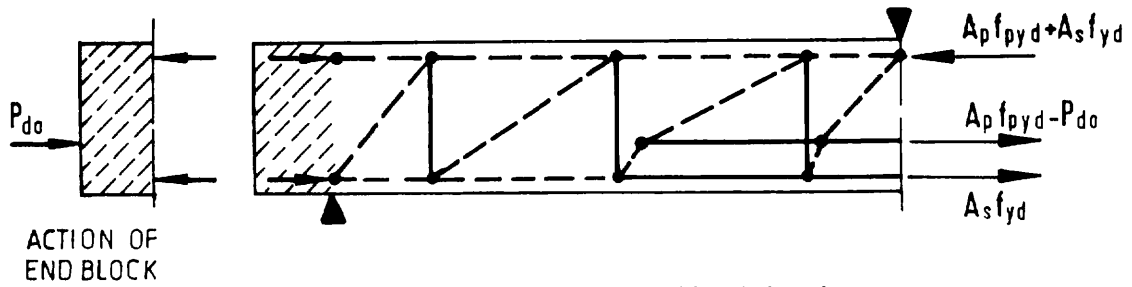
Simple truss model for a beam with a horizontal bonded tendon
